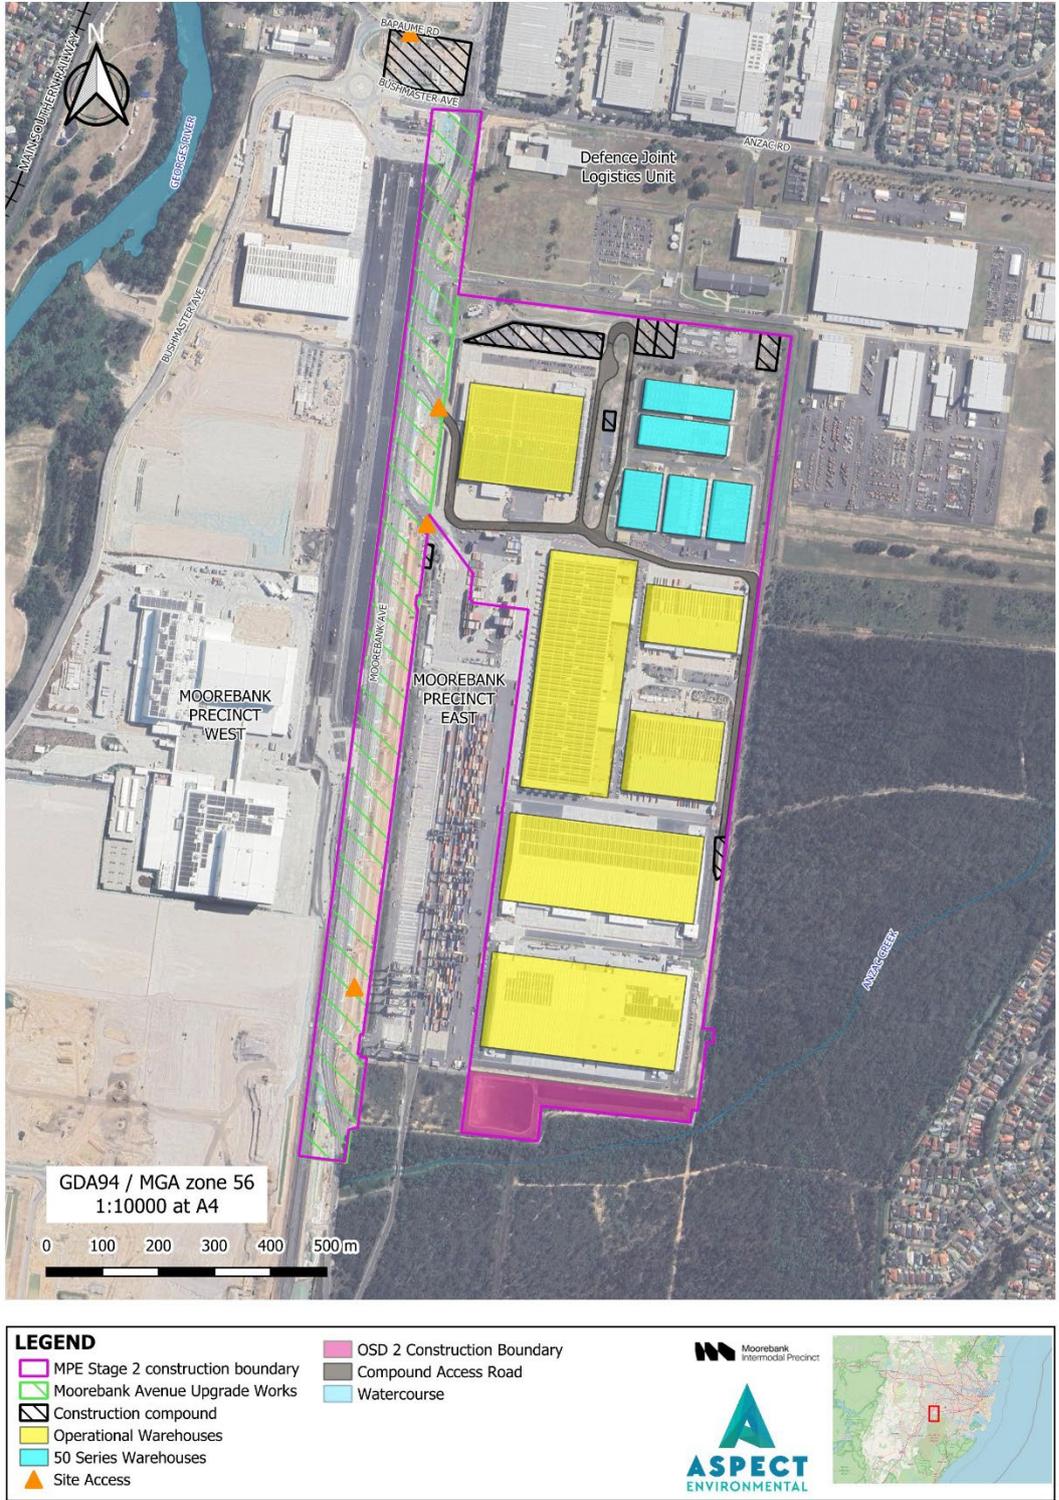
Site Access, Compounds and Stockpiling Locations
